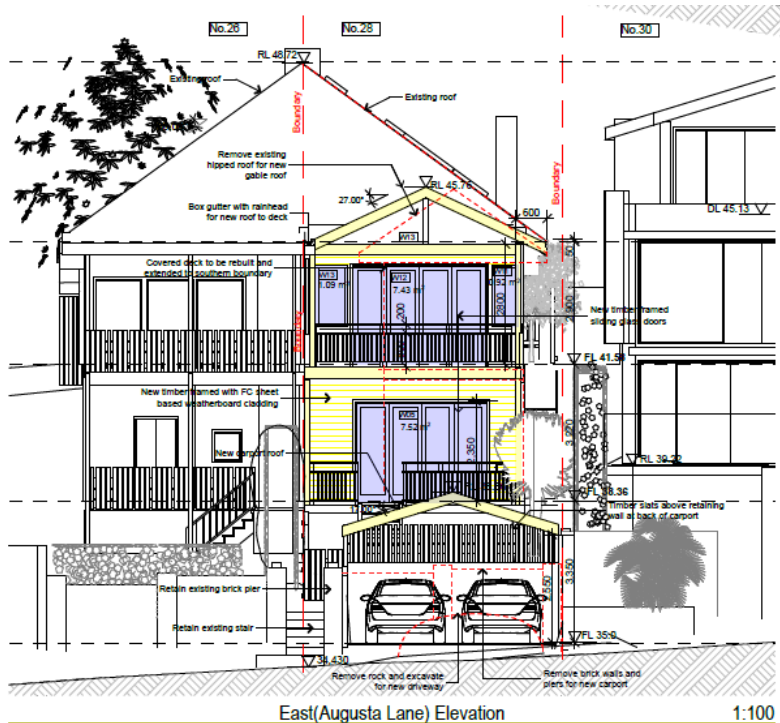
Eastern elevation taken of the alterations and additions showing the building height non compliance
